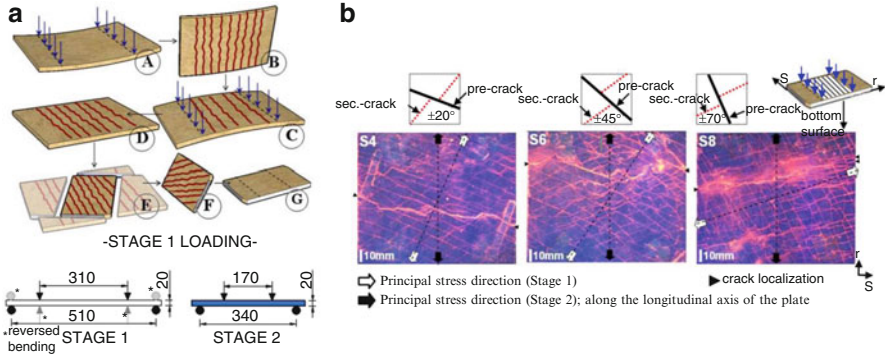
Configuration and procedure of bi-directional multiple cracking tests (a) and typical crack pattern after failure (b) [18]
